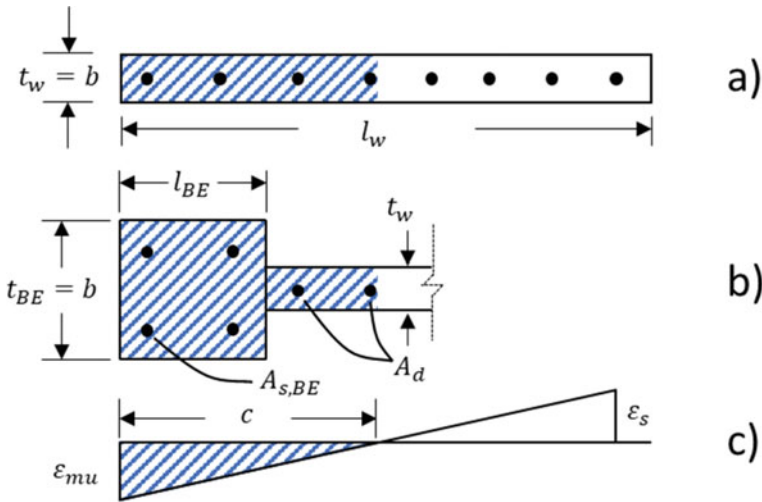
Dimensions of a rectangular cross-section, b wall cross-section with BE, and c strain distribution
